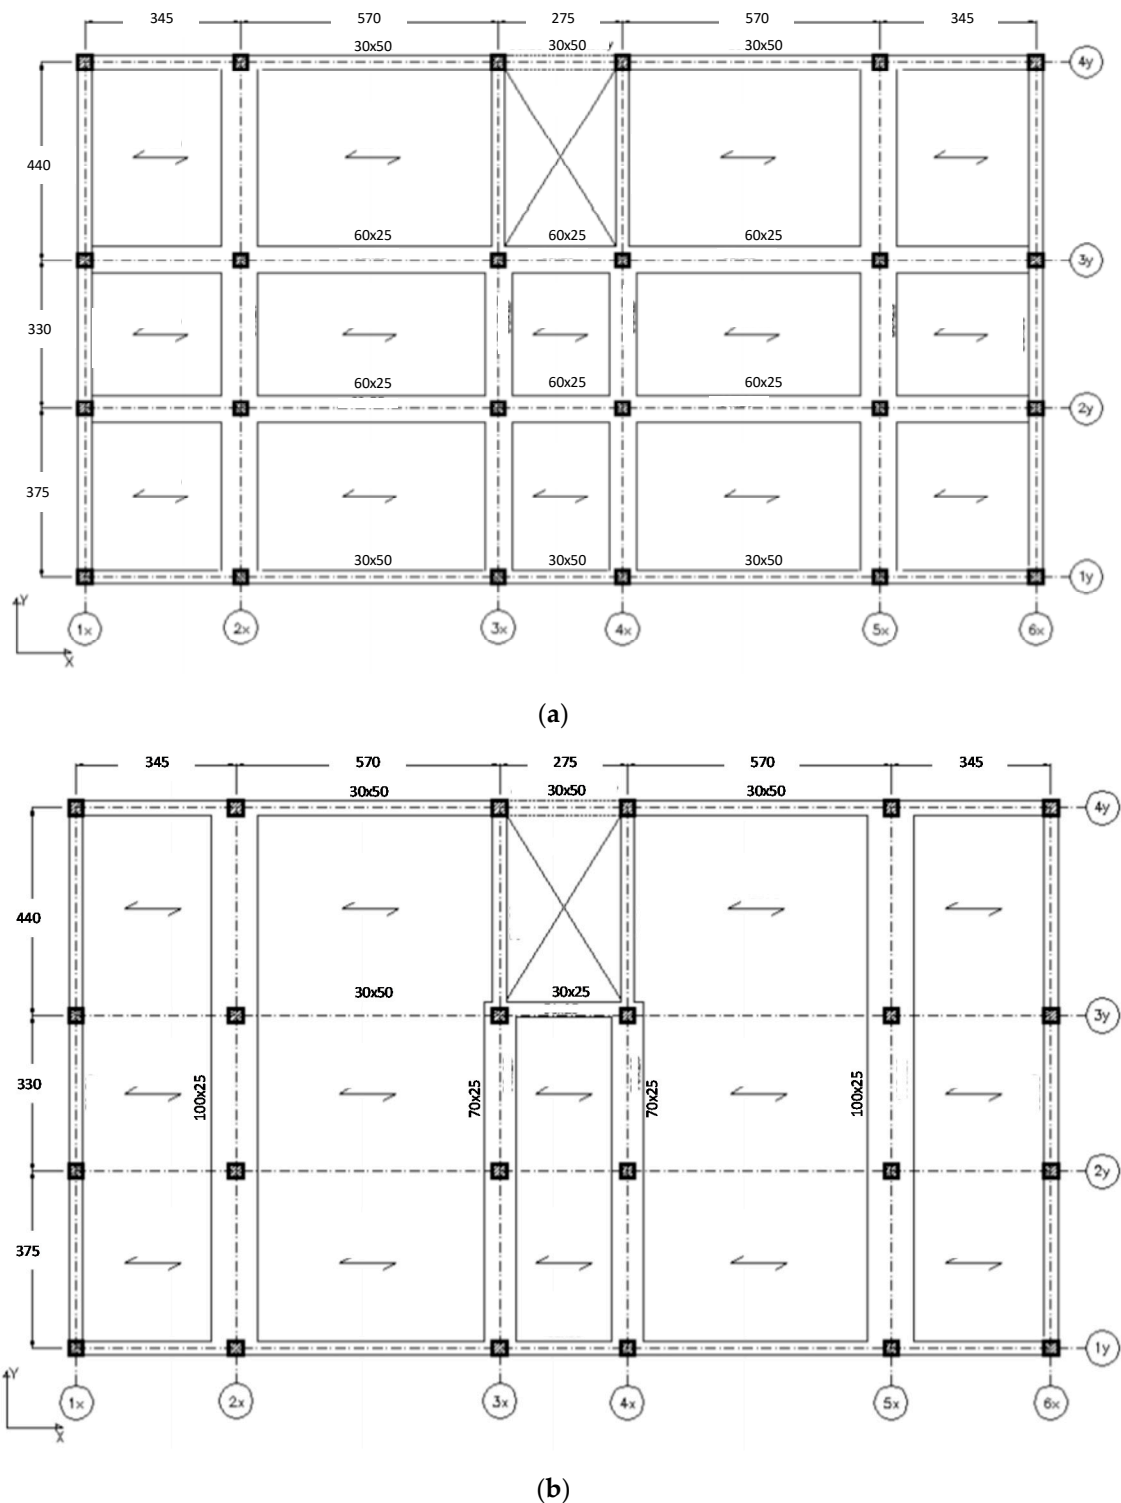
Floor plan with one way slab orientation for (a) SLD building and (b) GLD building.
